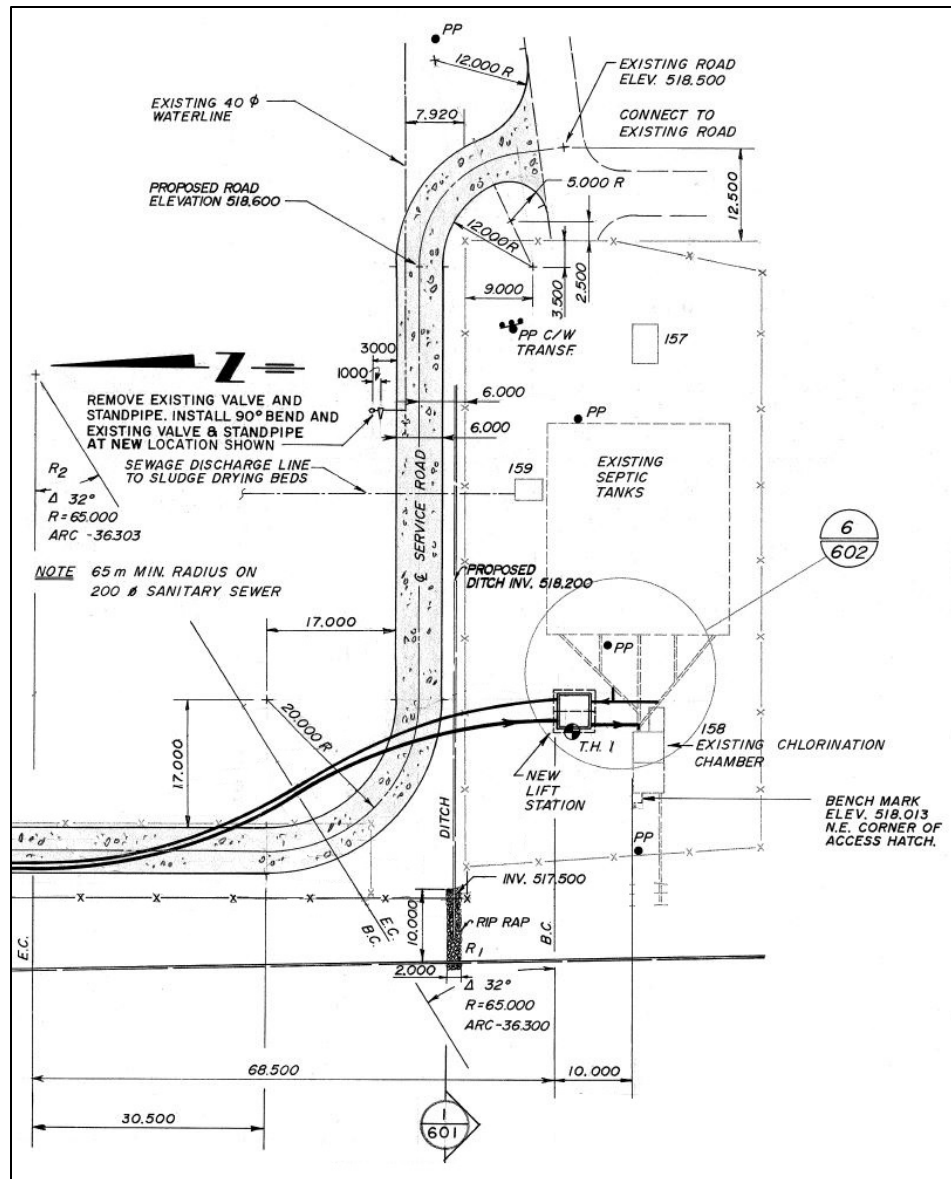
1988 Construction drawing - Site plan of lift station area
